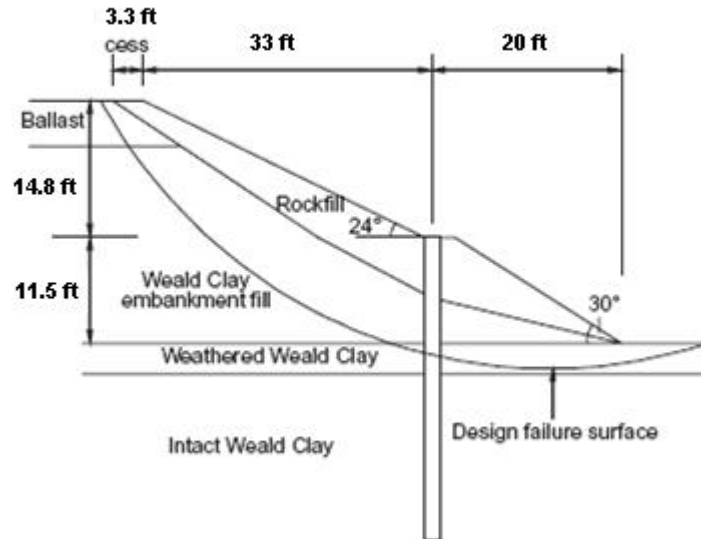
Embankment profile after the construction platform had been regraded (Smethurst and Powerie 2007)
